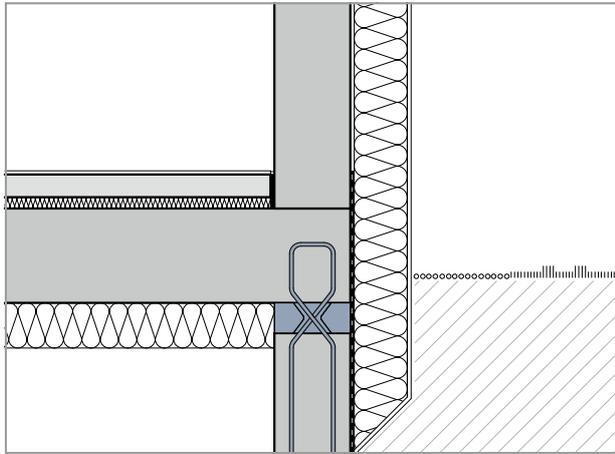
Schöck Sconnex® type W with external wall and under-slab insulation
